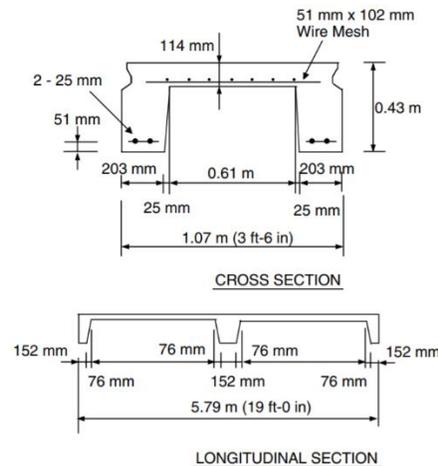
23 Precast channel beam cross section and longitudinal section [20].
